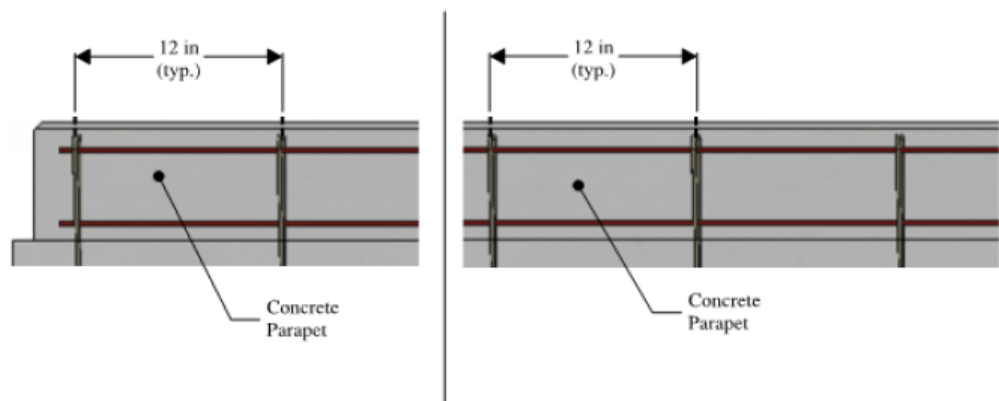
Elevation View of Bridge Rail System at Ends/Joints
